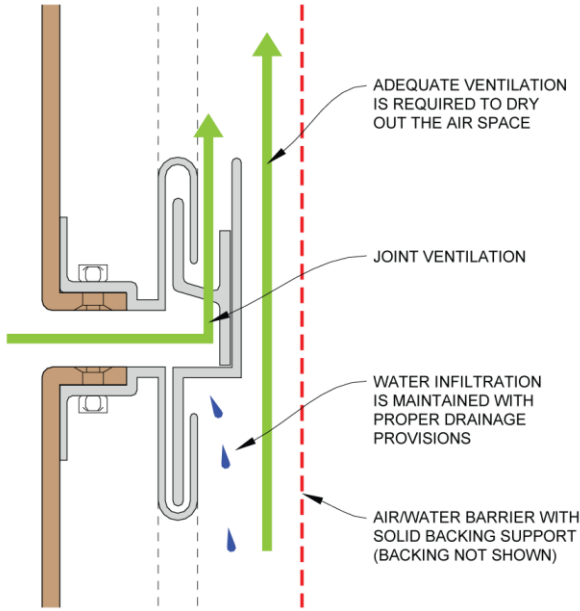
Drained and Back Ventilated Rainscreen System Horizontal Joint (Example)
